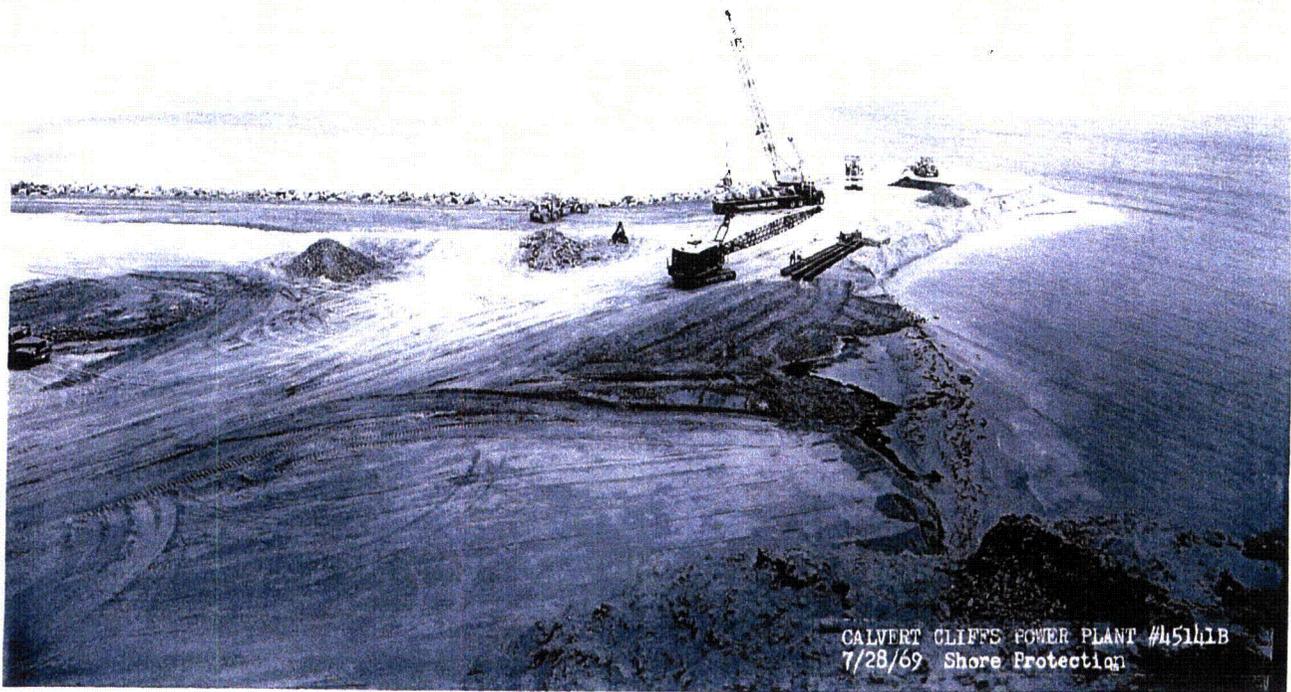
View of CCNPP During Construction (6/30/69) Showing Emplacement of Landfill and Shoreline Protection (Riprap) in Vicinity of CC3 Project Area Expansion, Facing Northwest
